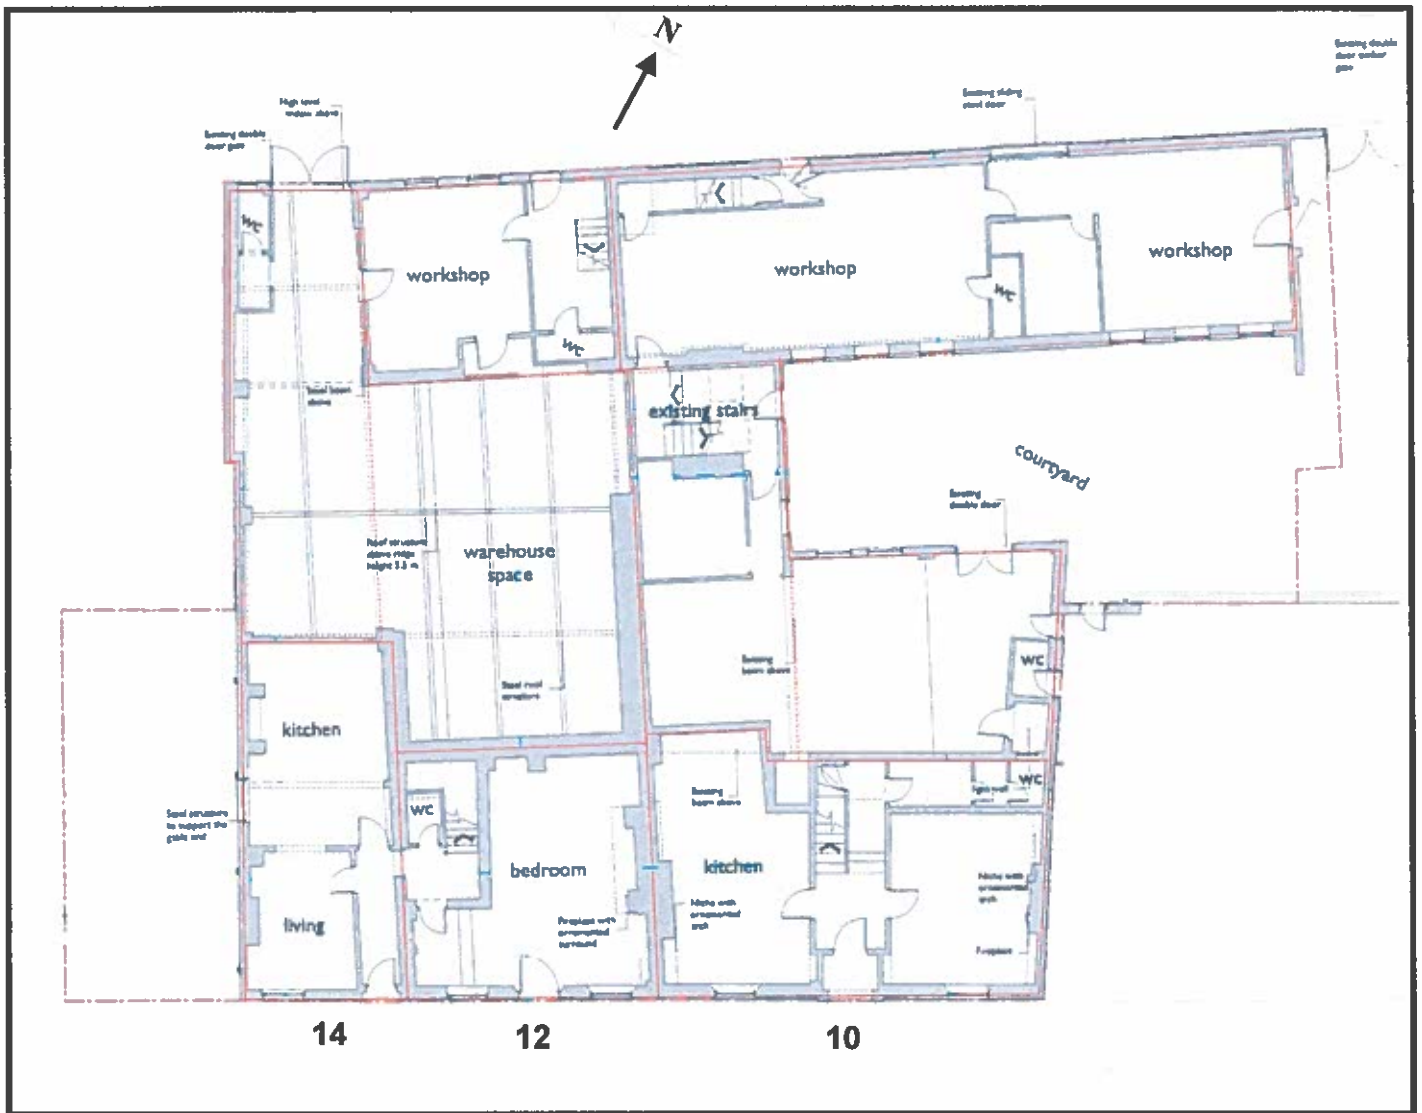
Existing ground plan of 10-14 St Helen's Street, Derby. Outline shown in red as used on other figures. Scale 1:200. Copy courtesy of Franklin Ellis Architects.
